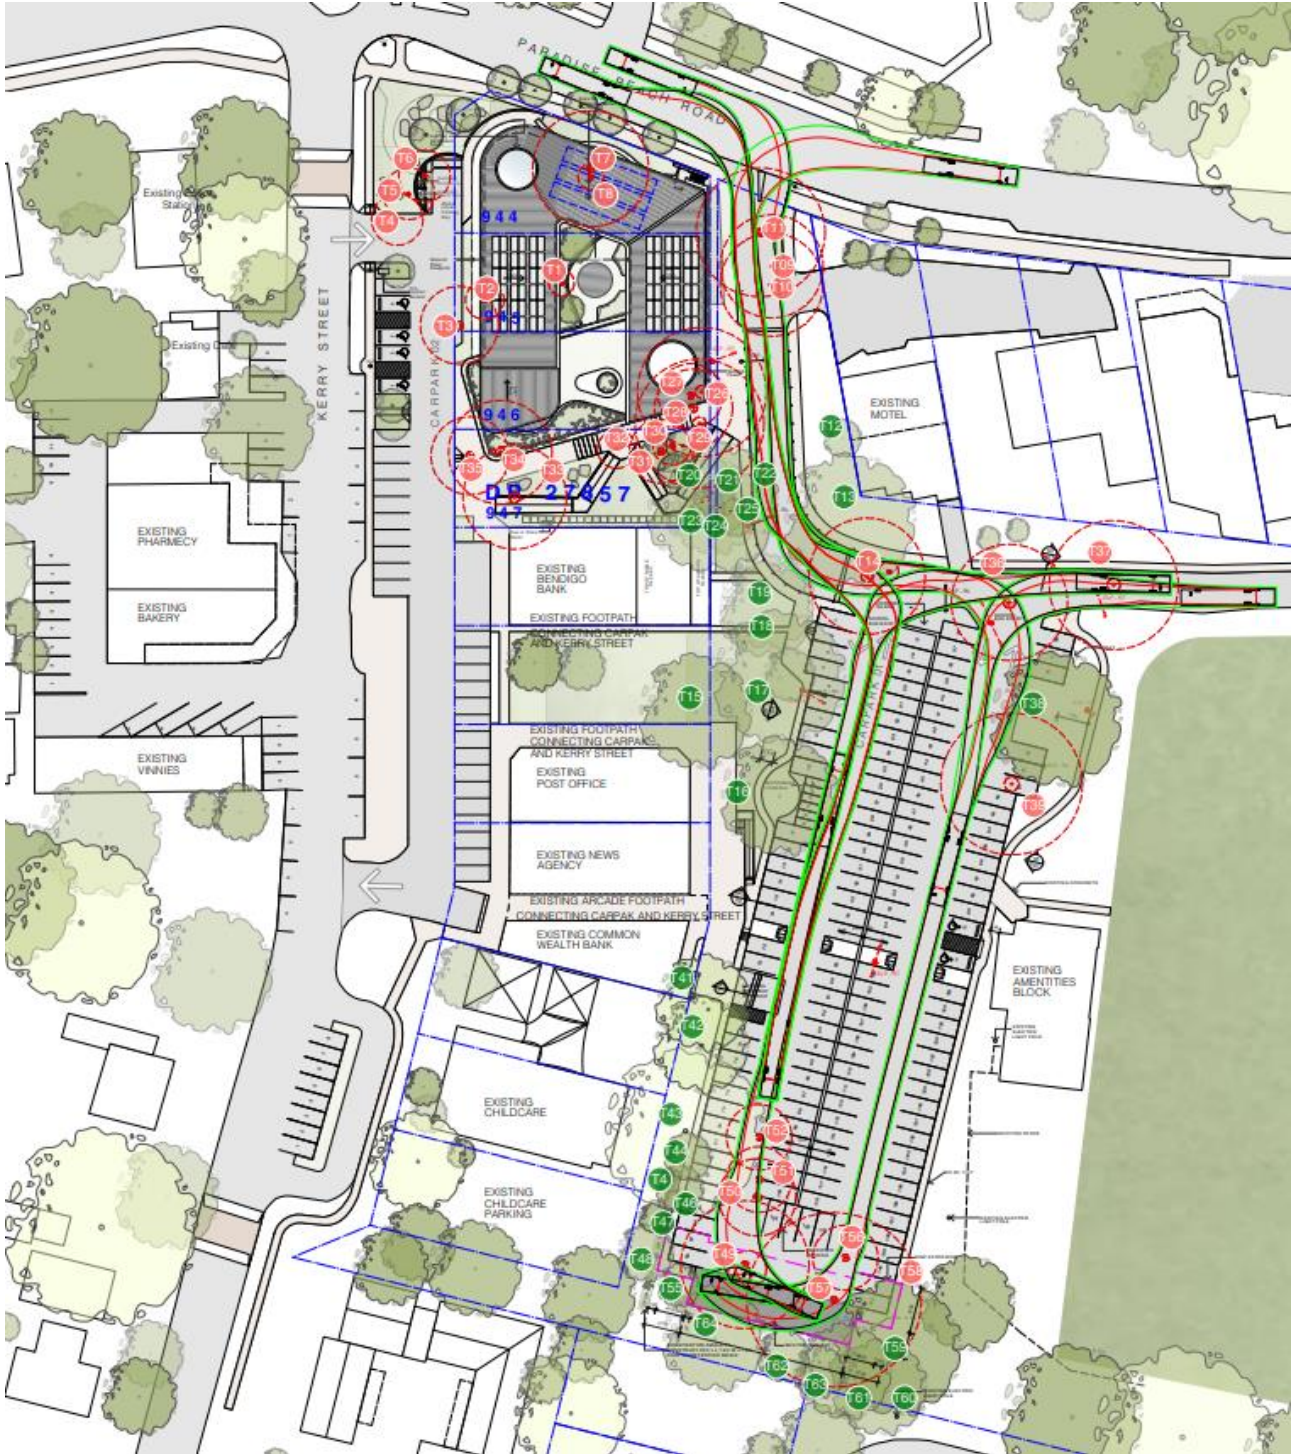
Site Plan Prepared by Brewster Hjorth Architects
